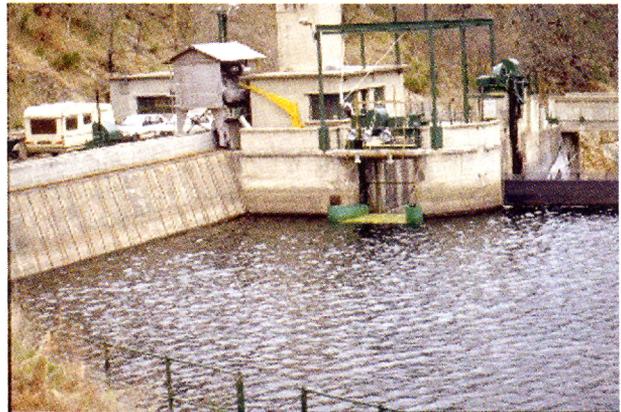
Downstream surface bypass at the Poutes dam (Allier river). The 10 m deep power intake is located on the left.
